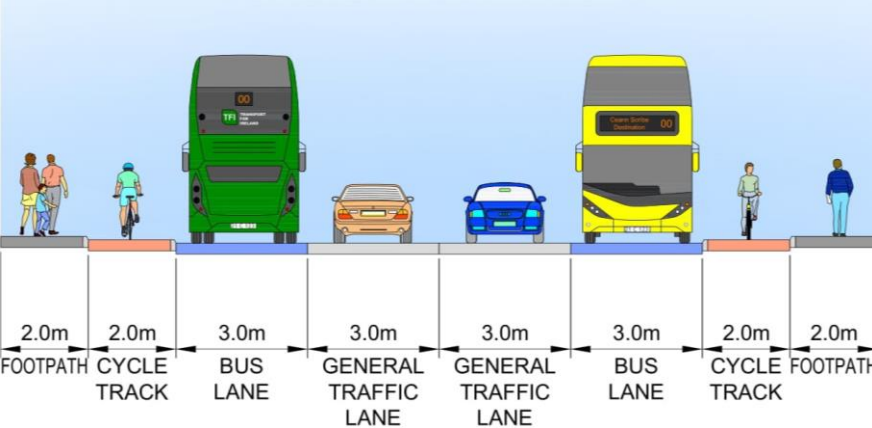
Section 2, Proposed Option 5 – Cross Section A-A
